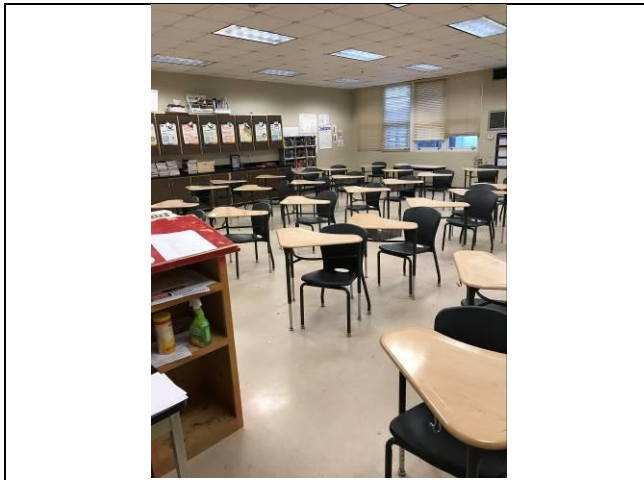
View of typical interior finishes inside room 410 in 9th grade building.
